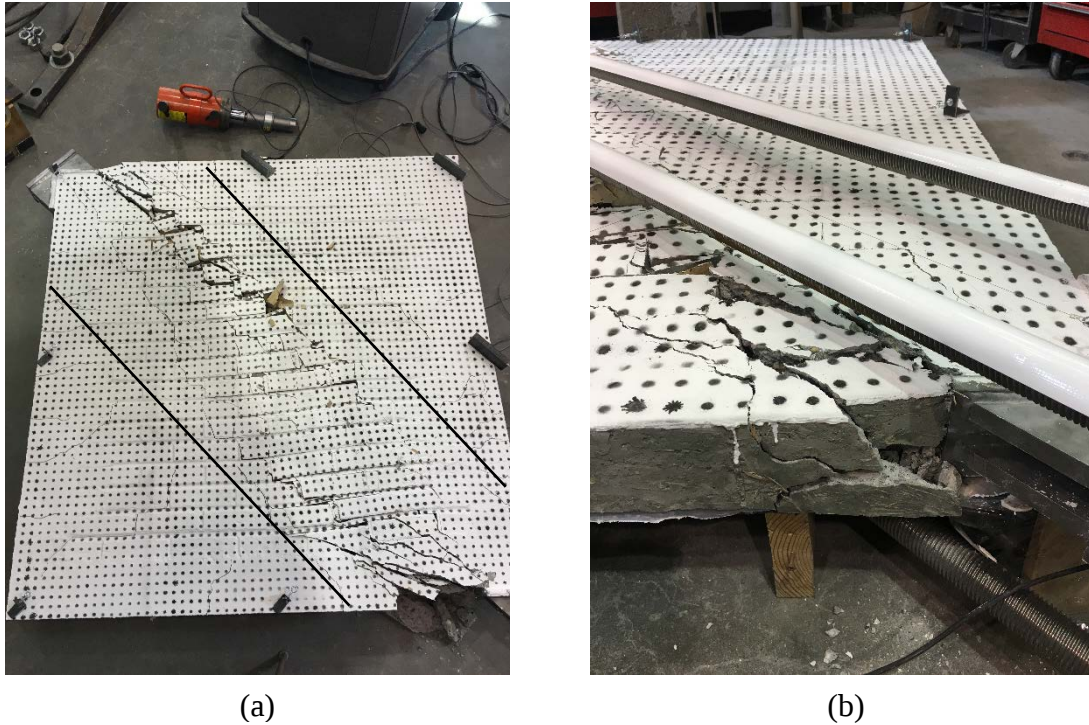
Uniform effective shear crack within confined masonry wall shown (a) from a profile view and (b) extending through the concrete tie-members
